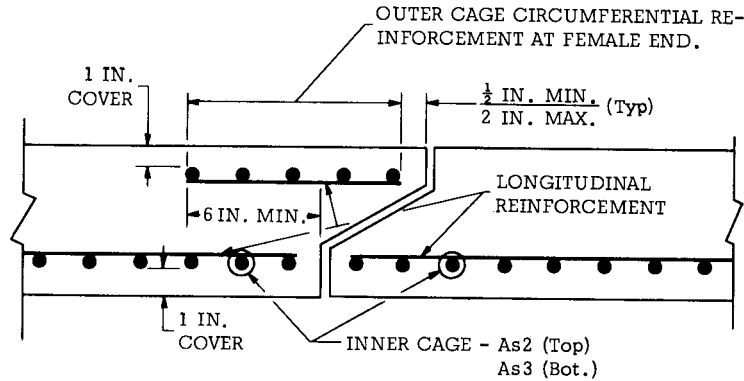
Section A-A Top and Bottom Slab Joint Reinforcement
